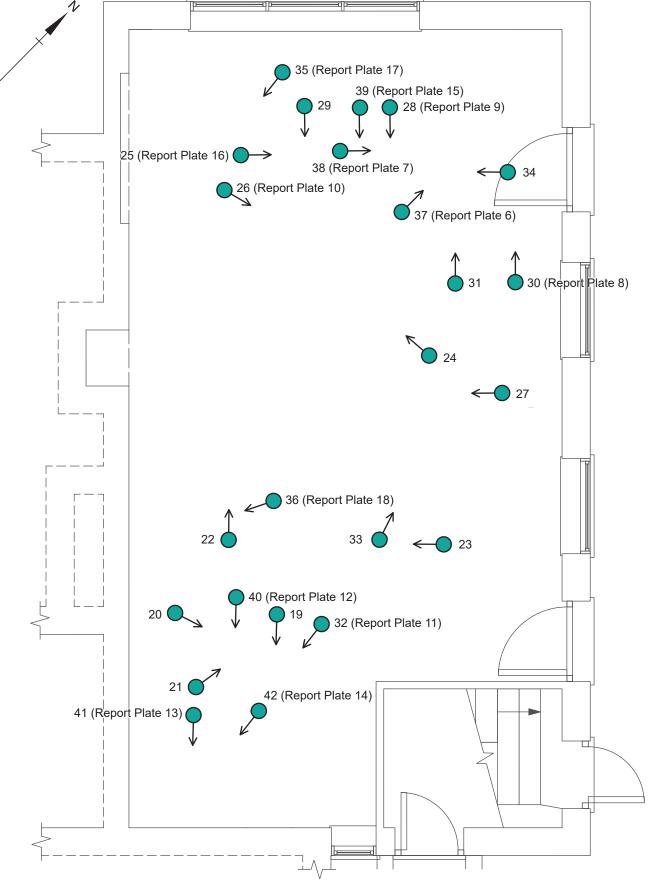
Ground floor ceiling following works 1:50 (After Native Architects, Drawing 305)
